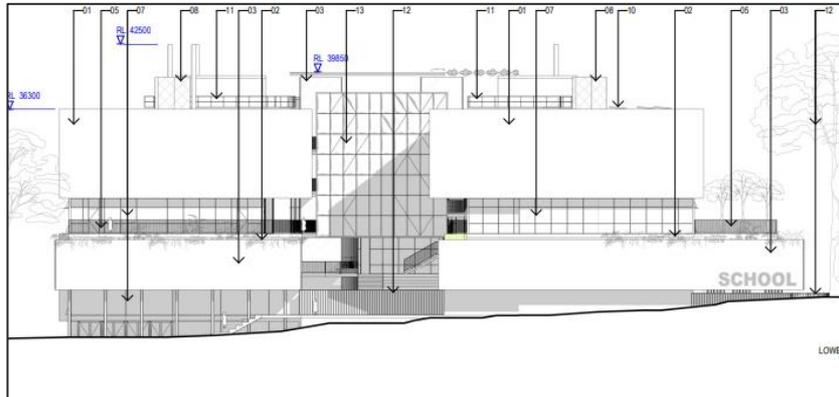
Approved eastern elevation (Source: Applicant's EIS 2020)
